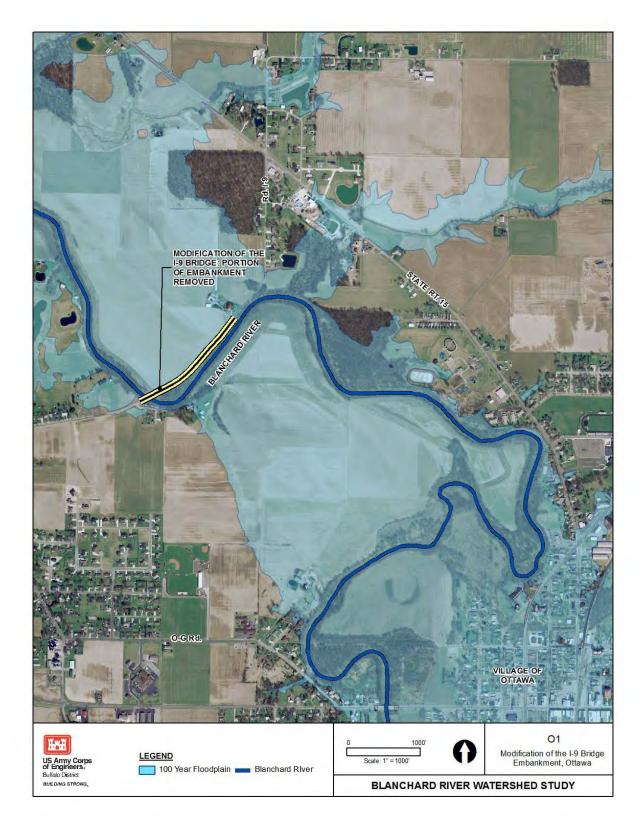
Alternative Plan O1. Modification of I-9 Bridge Embankment located west and downstream of Village of Ottawa, OH.
